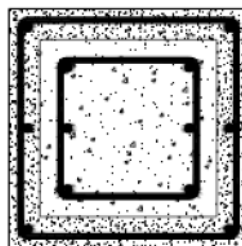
Cross-section dimensions of a column reinforced by concrete jacketing
